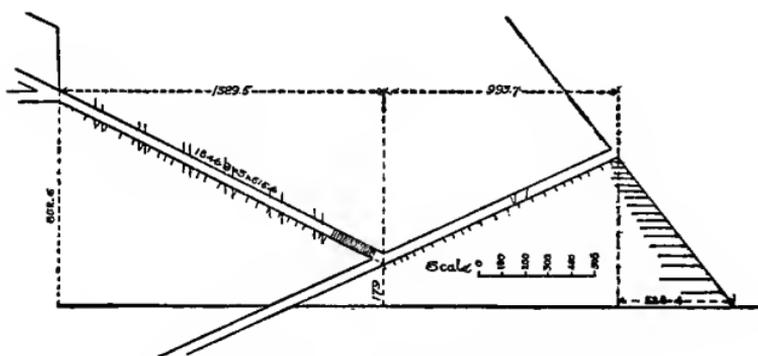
ELEVATION FROM PAVEMENT TO GALLERY.
